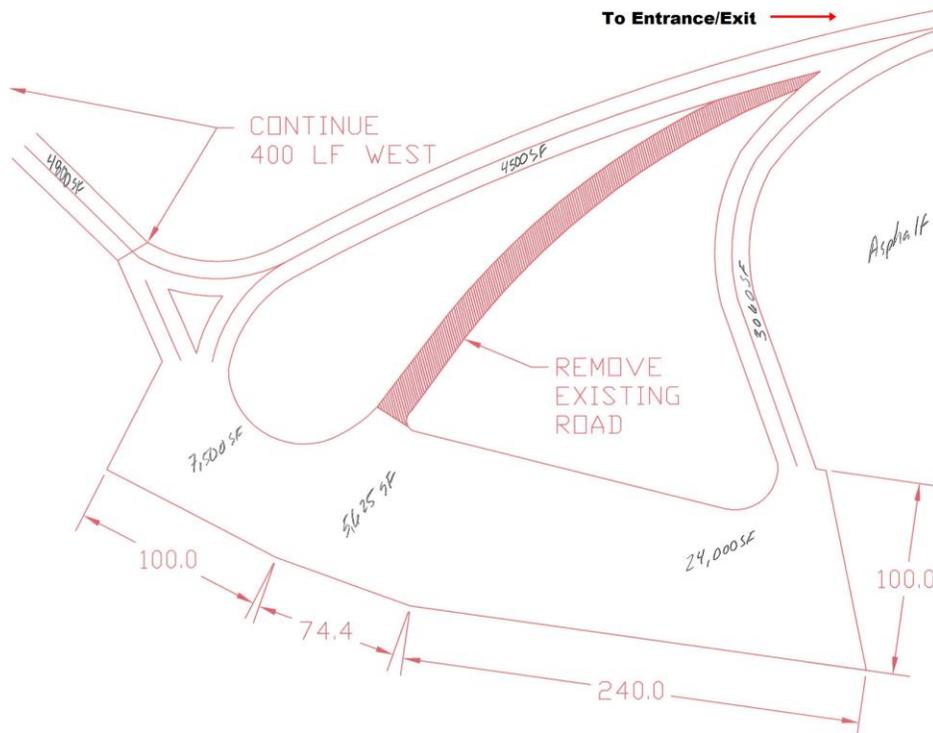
Road Construction showing road removal and replacement, converging on main entrance/exit road. Movement from main road will continue to be a one-way loop from the fork on the main entrance/exit road.
